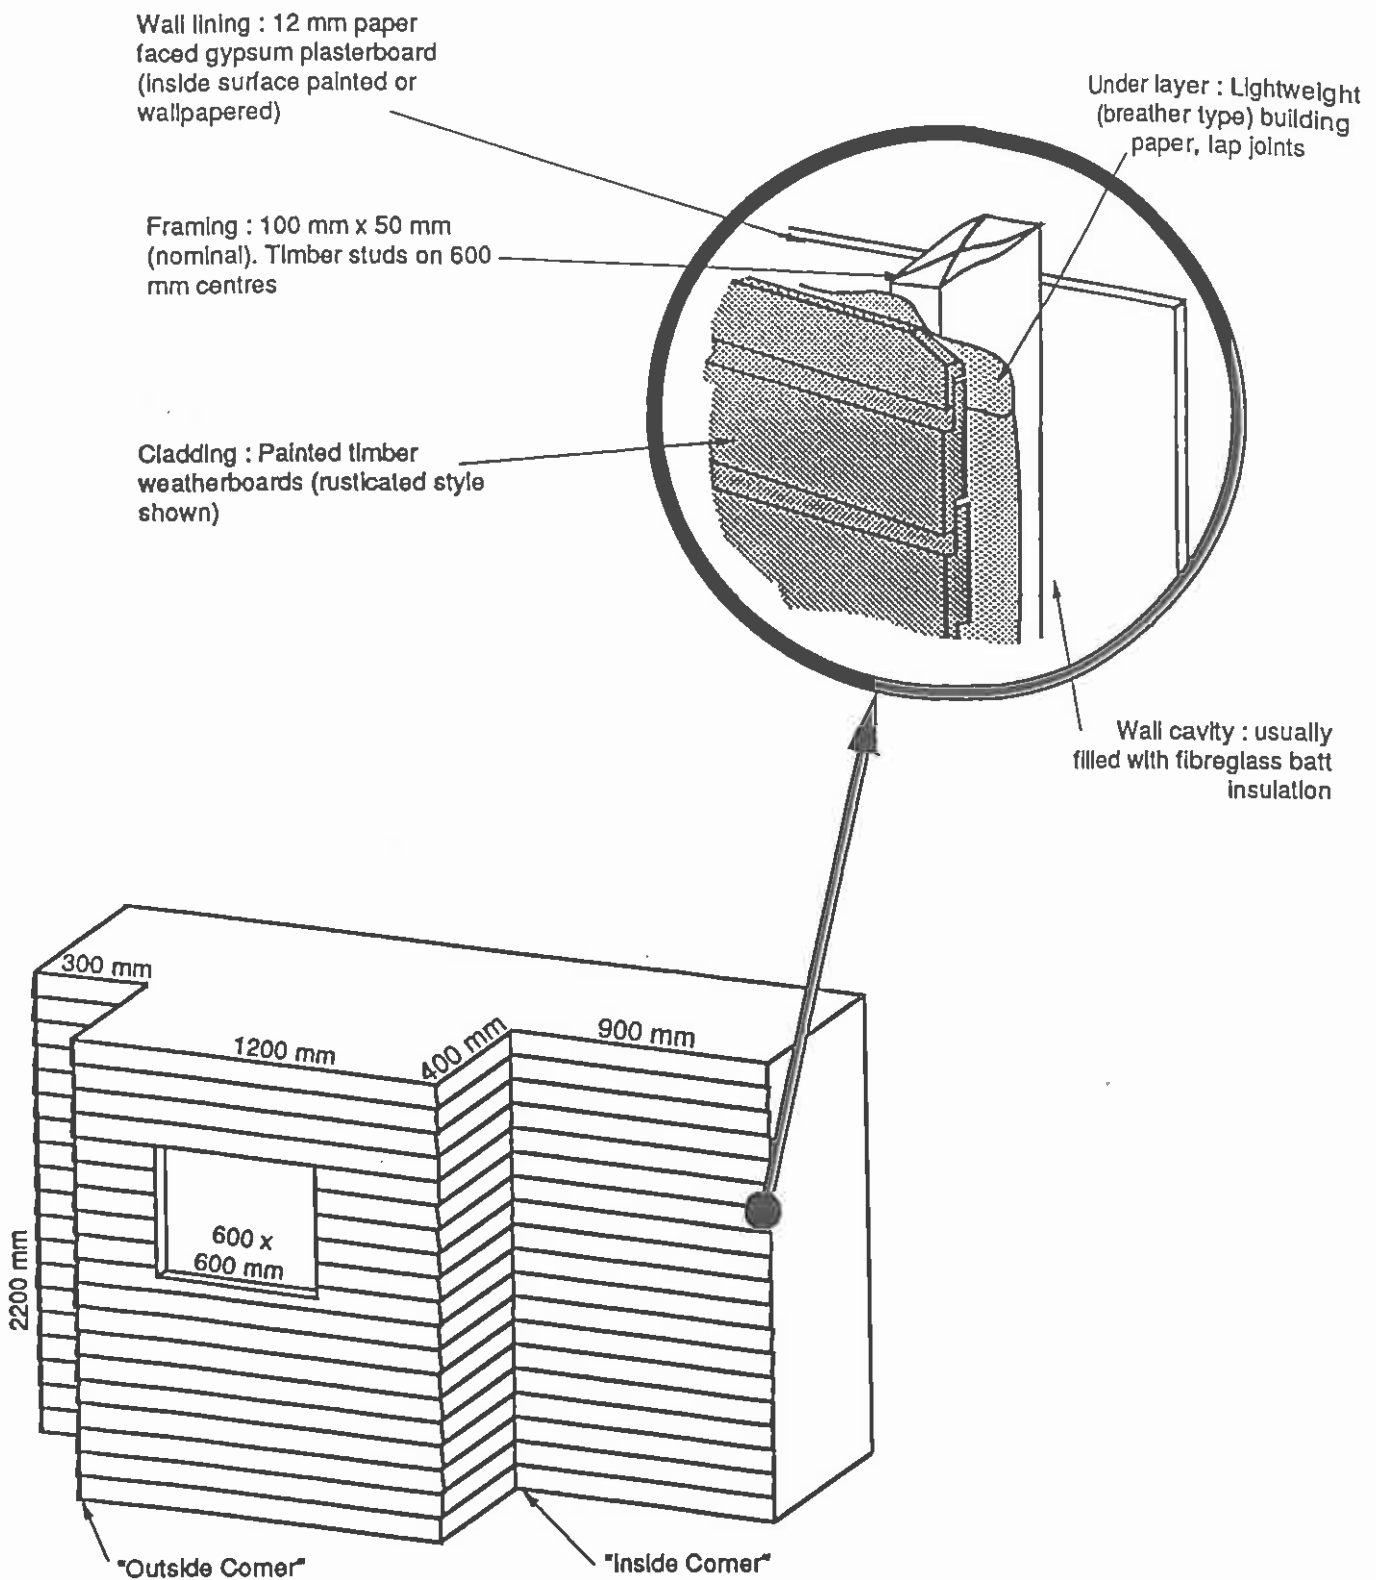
Test Walls Representing Typical New Zealand Wall Construction
